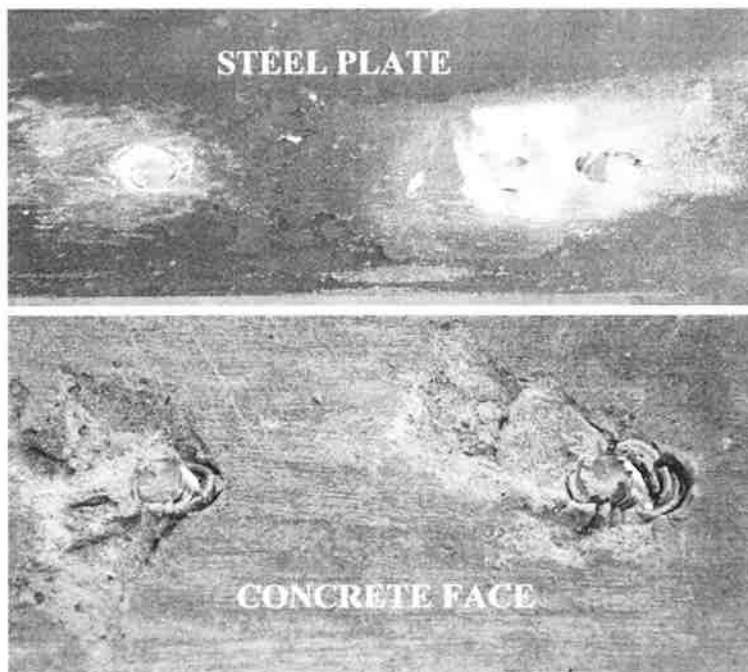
Failure mode of threaded rod bolts
